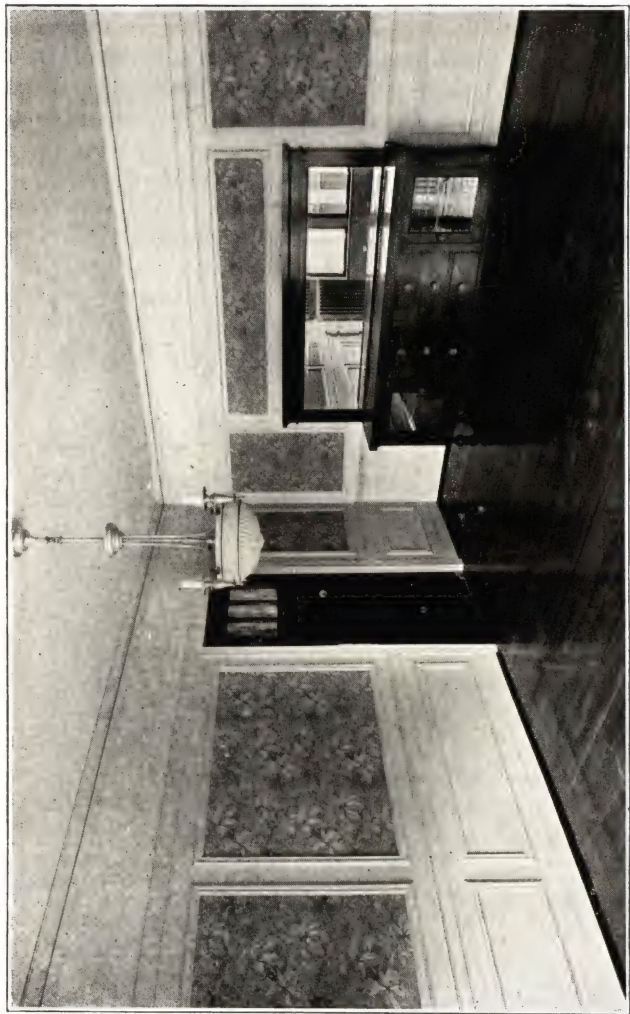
Dining Room Walls Paneled Off with Mouldings. The Panel Centers Filled In with Wallpaper.
